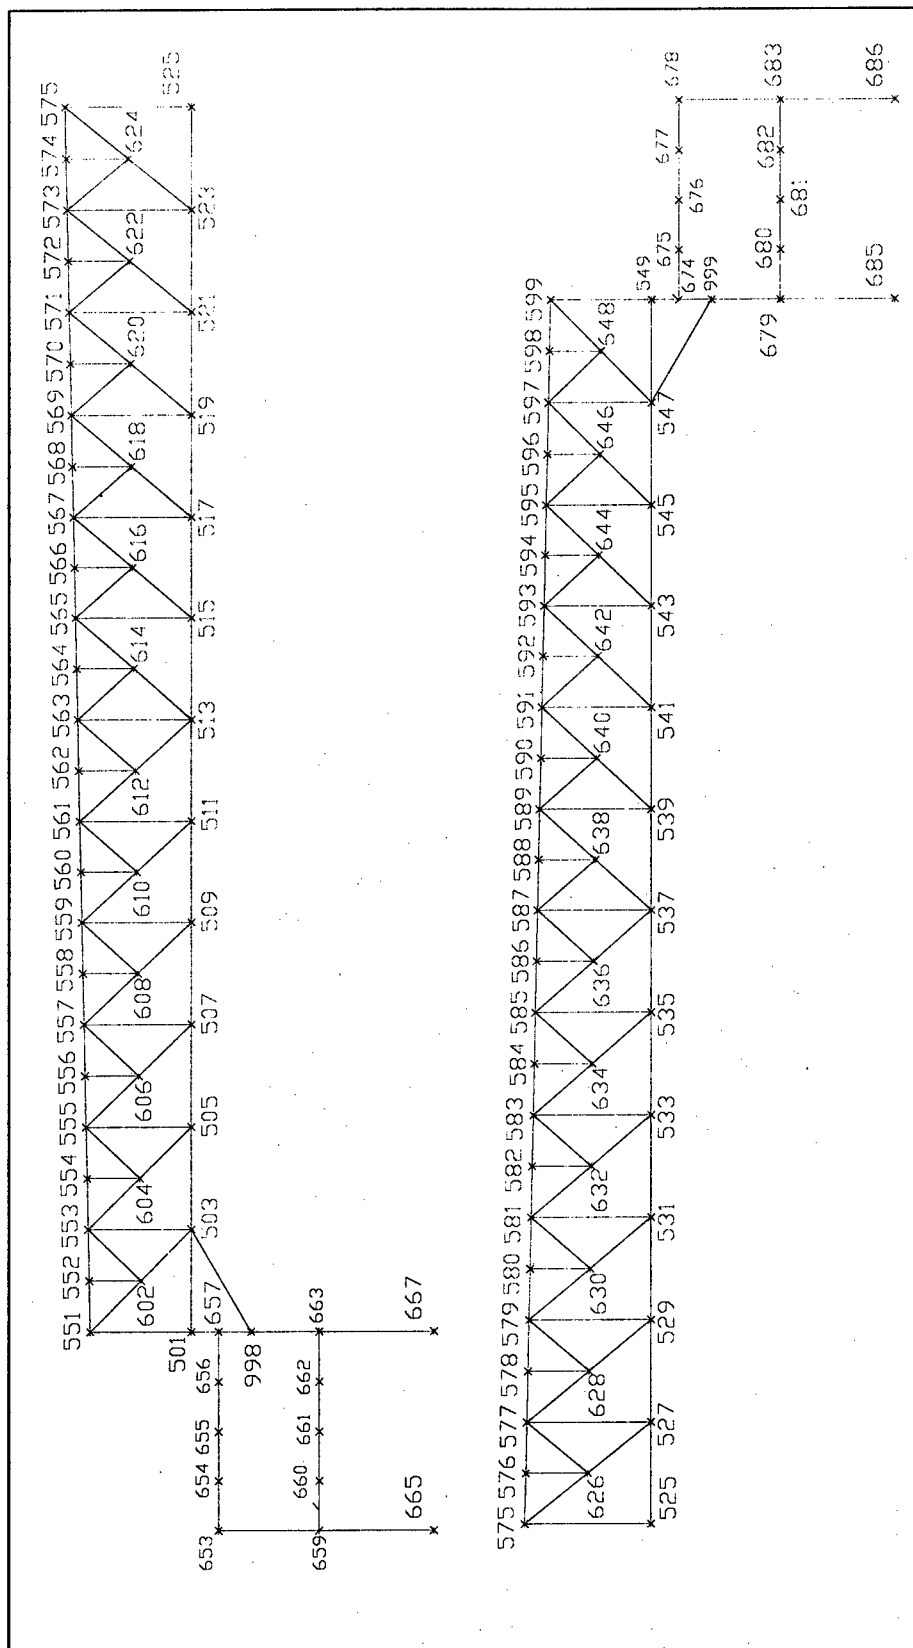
CCAD, TX, joint numbers for Truss T1 with knee braces, Hangars 43 and 47.
